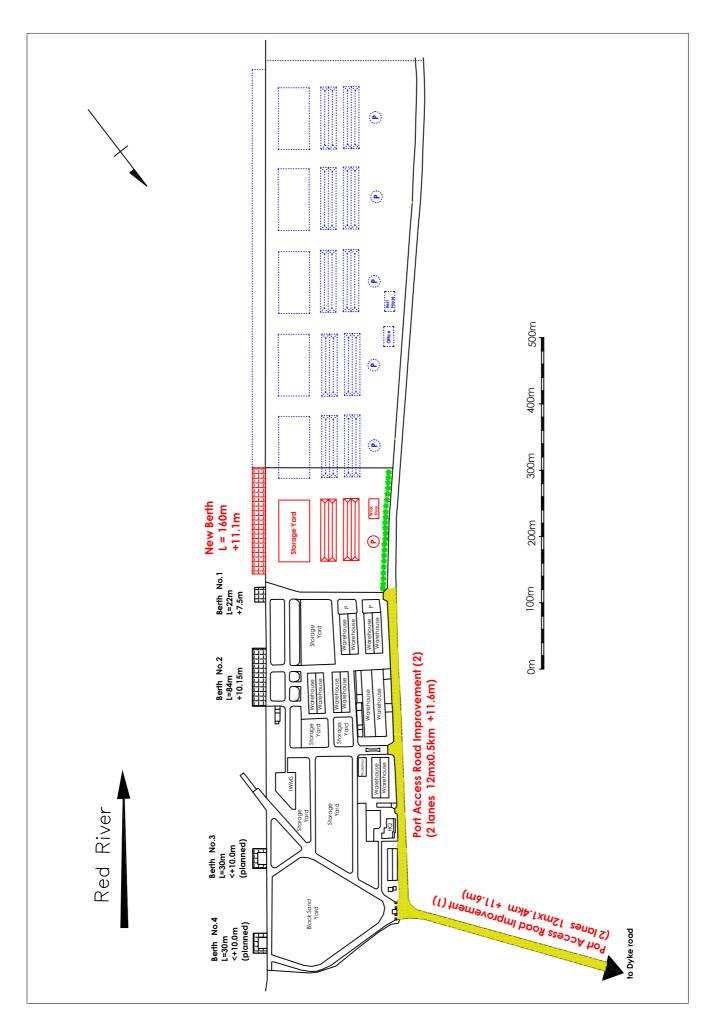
Short-term Development Plan of Khuyen Luong Port (2010)
